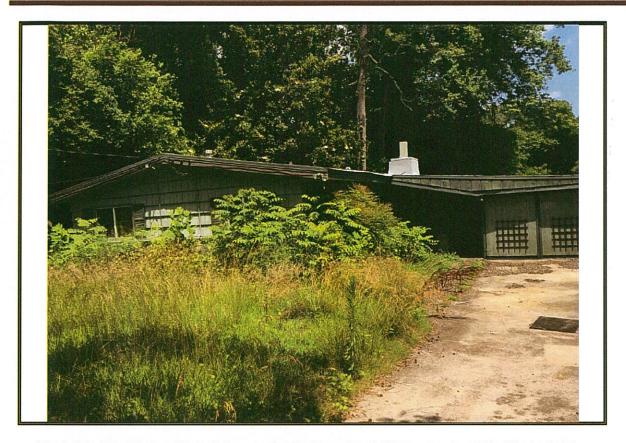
The Project Site building consisted of a residential home constructed with vinyl-siding and an asphalt shingle roof.
